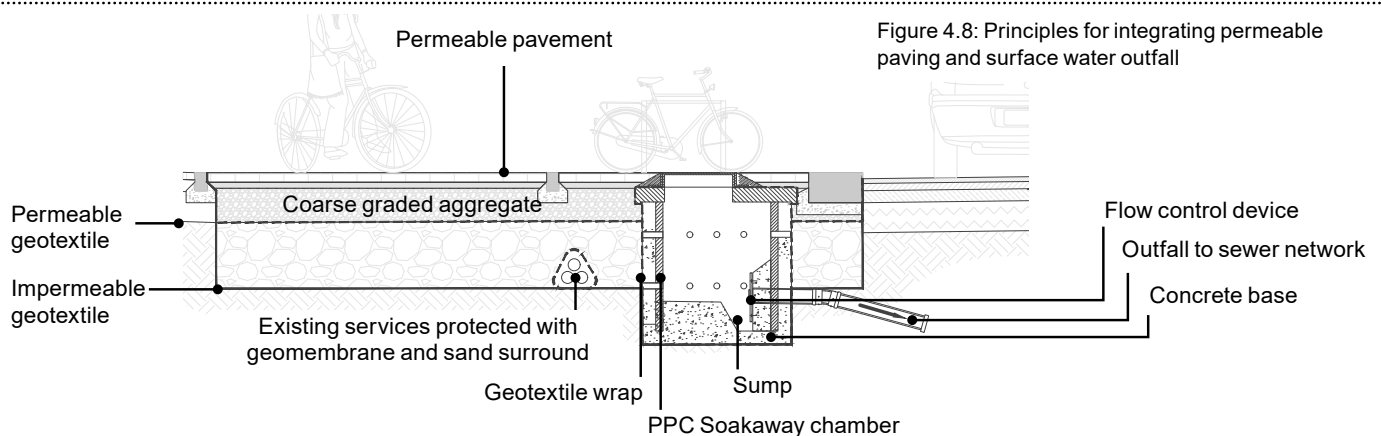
Principles for integrating permeable paving and surface water outfall
